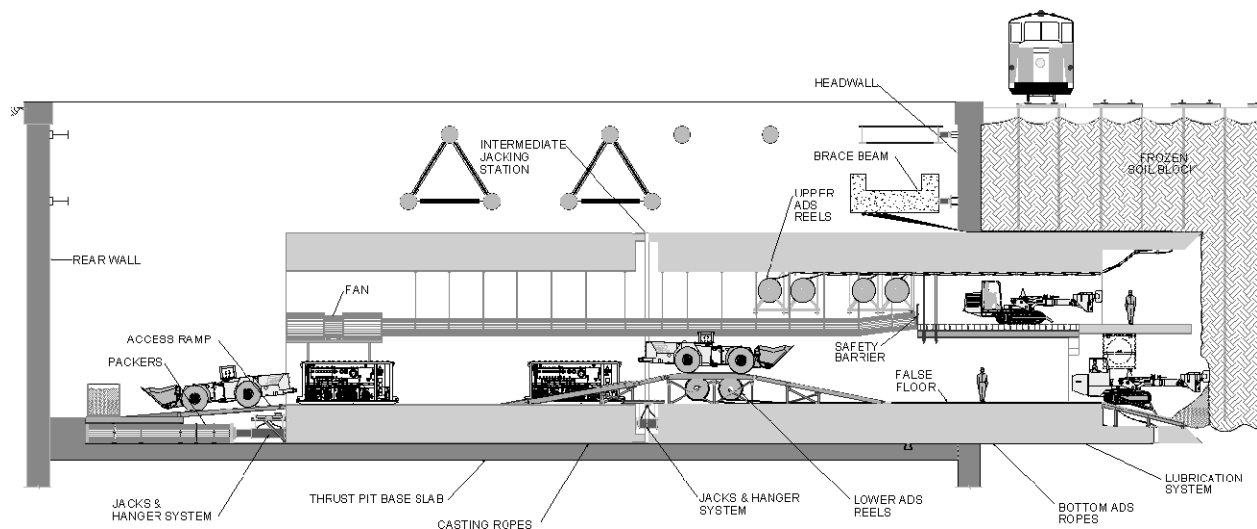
Typical Jacked Box Tunneling Sequence under an Existing Rail Track
